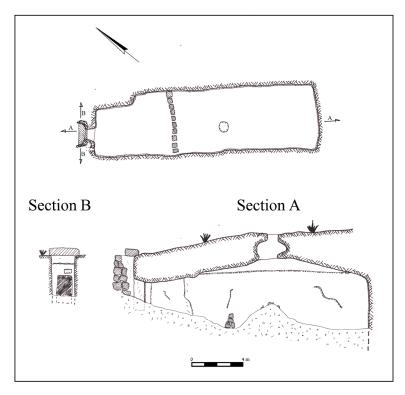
Plan and cross-section of the rectangular cistern (drawing: Eitan Klein)
